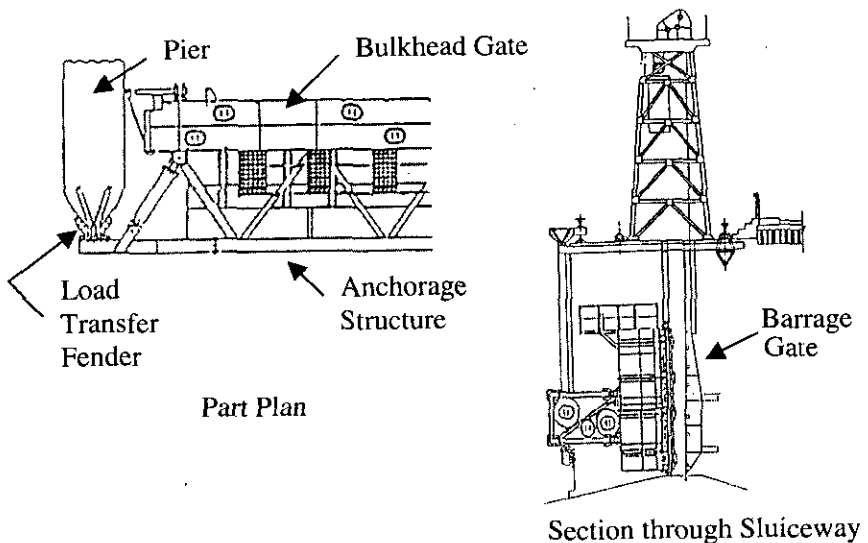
Concept of Bulkhead Gate positioned within Sluiceway
